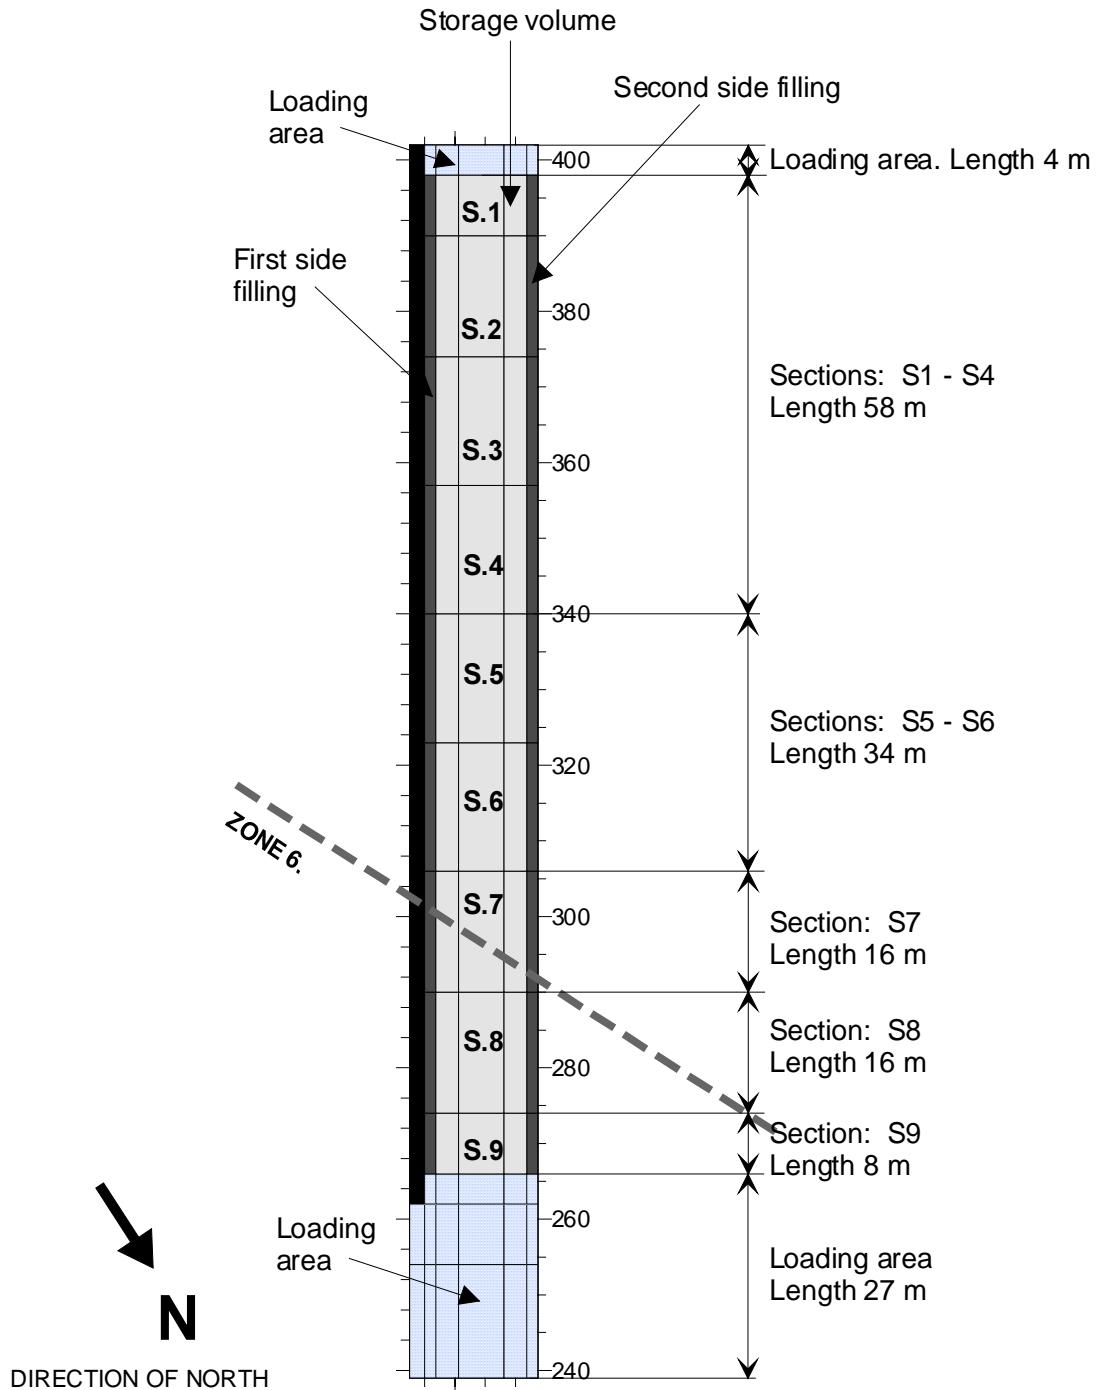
Horizontal cross-section through the detailed model at an elevation of -82 masl. The figure gives the BTF1 deposition tunnel and the position of fracture zone 6, as well as the size and locations of the horizontal sections for which the flow is studied.
